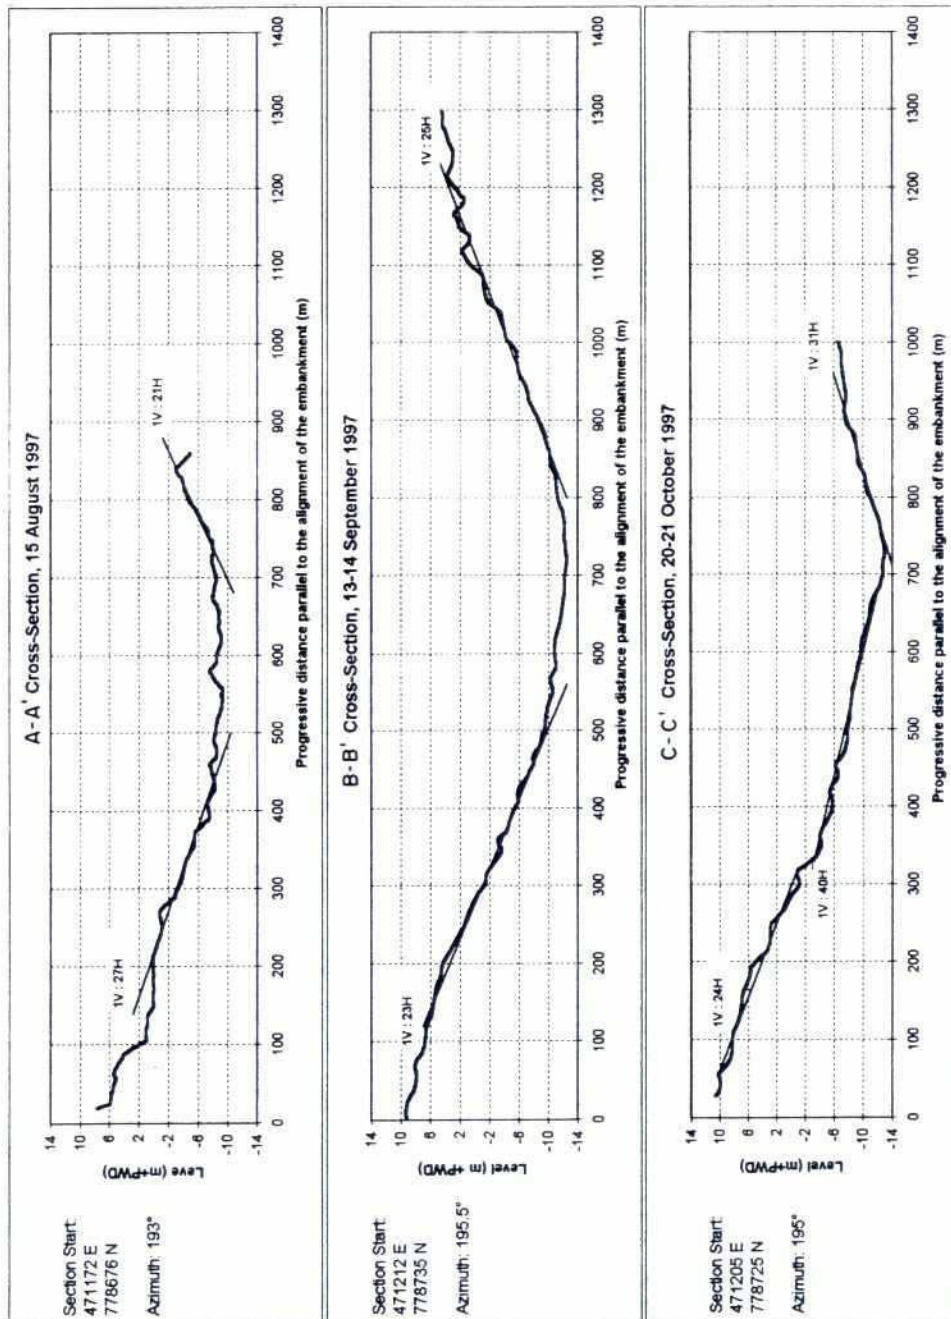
Slopes in longitudinal sections of the scour hole
